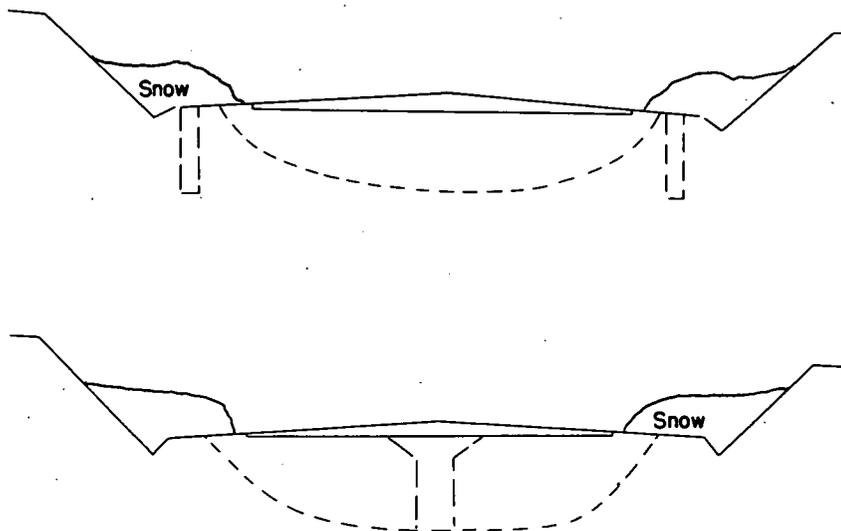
Pavement Section to Eliminate Frost Action. (After Wilson)
